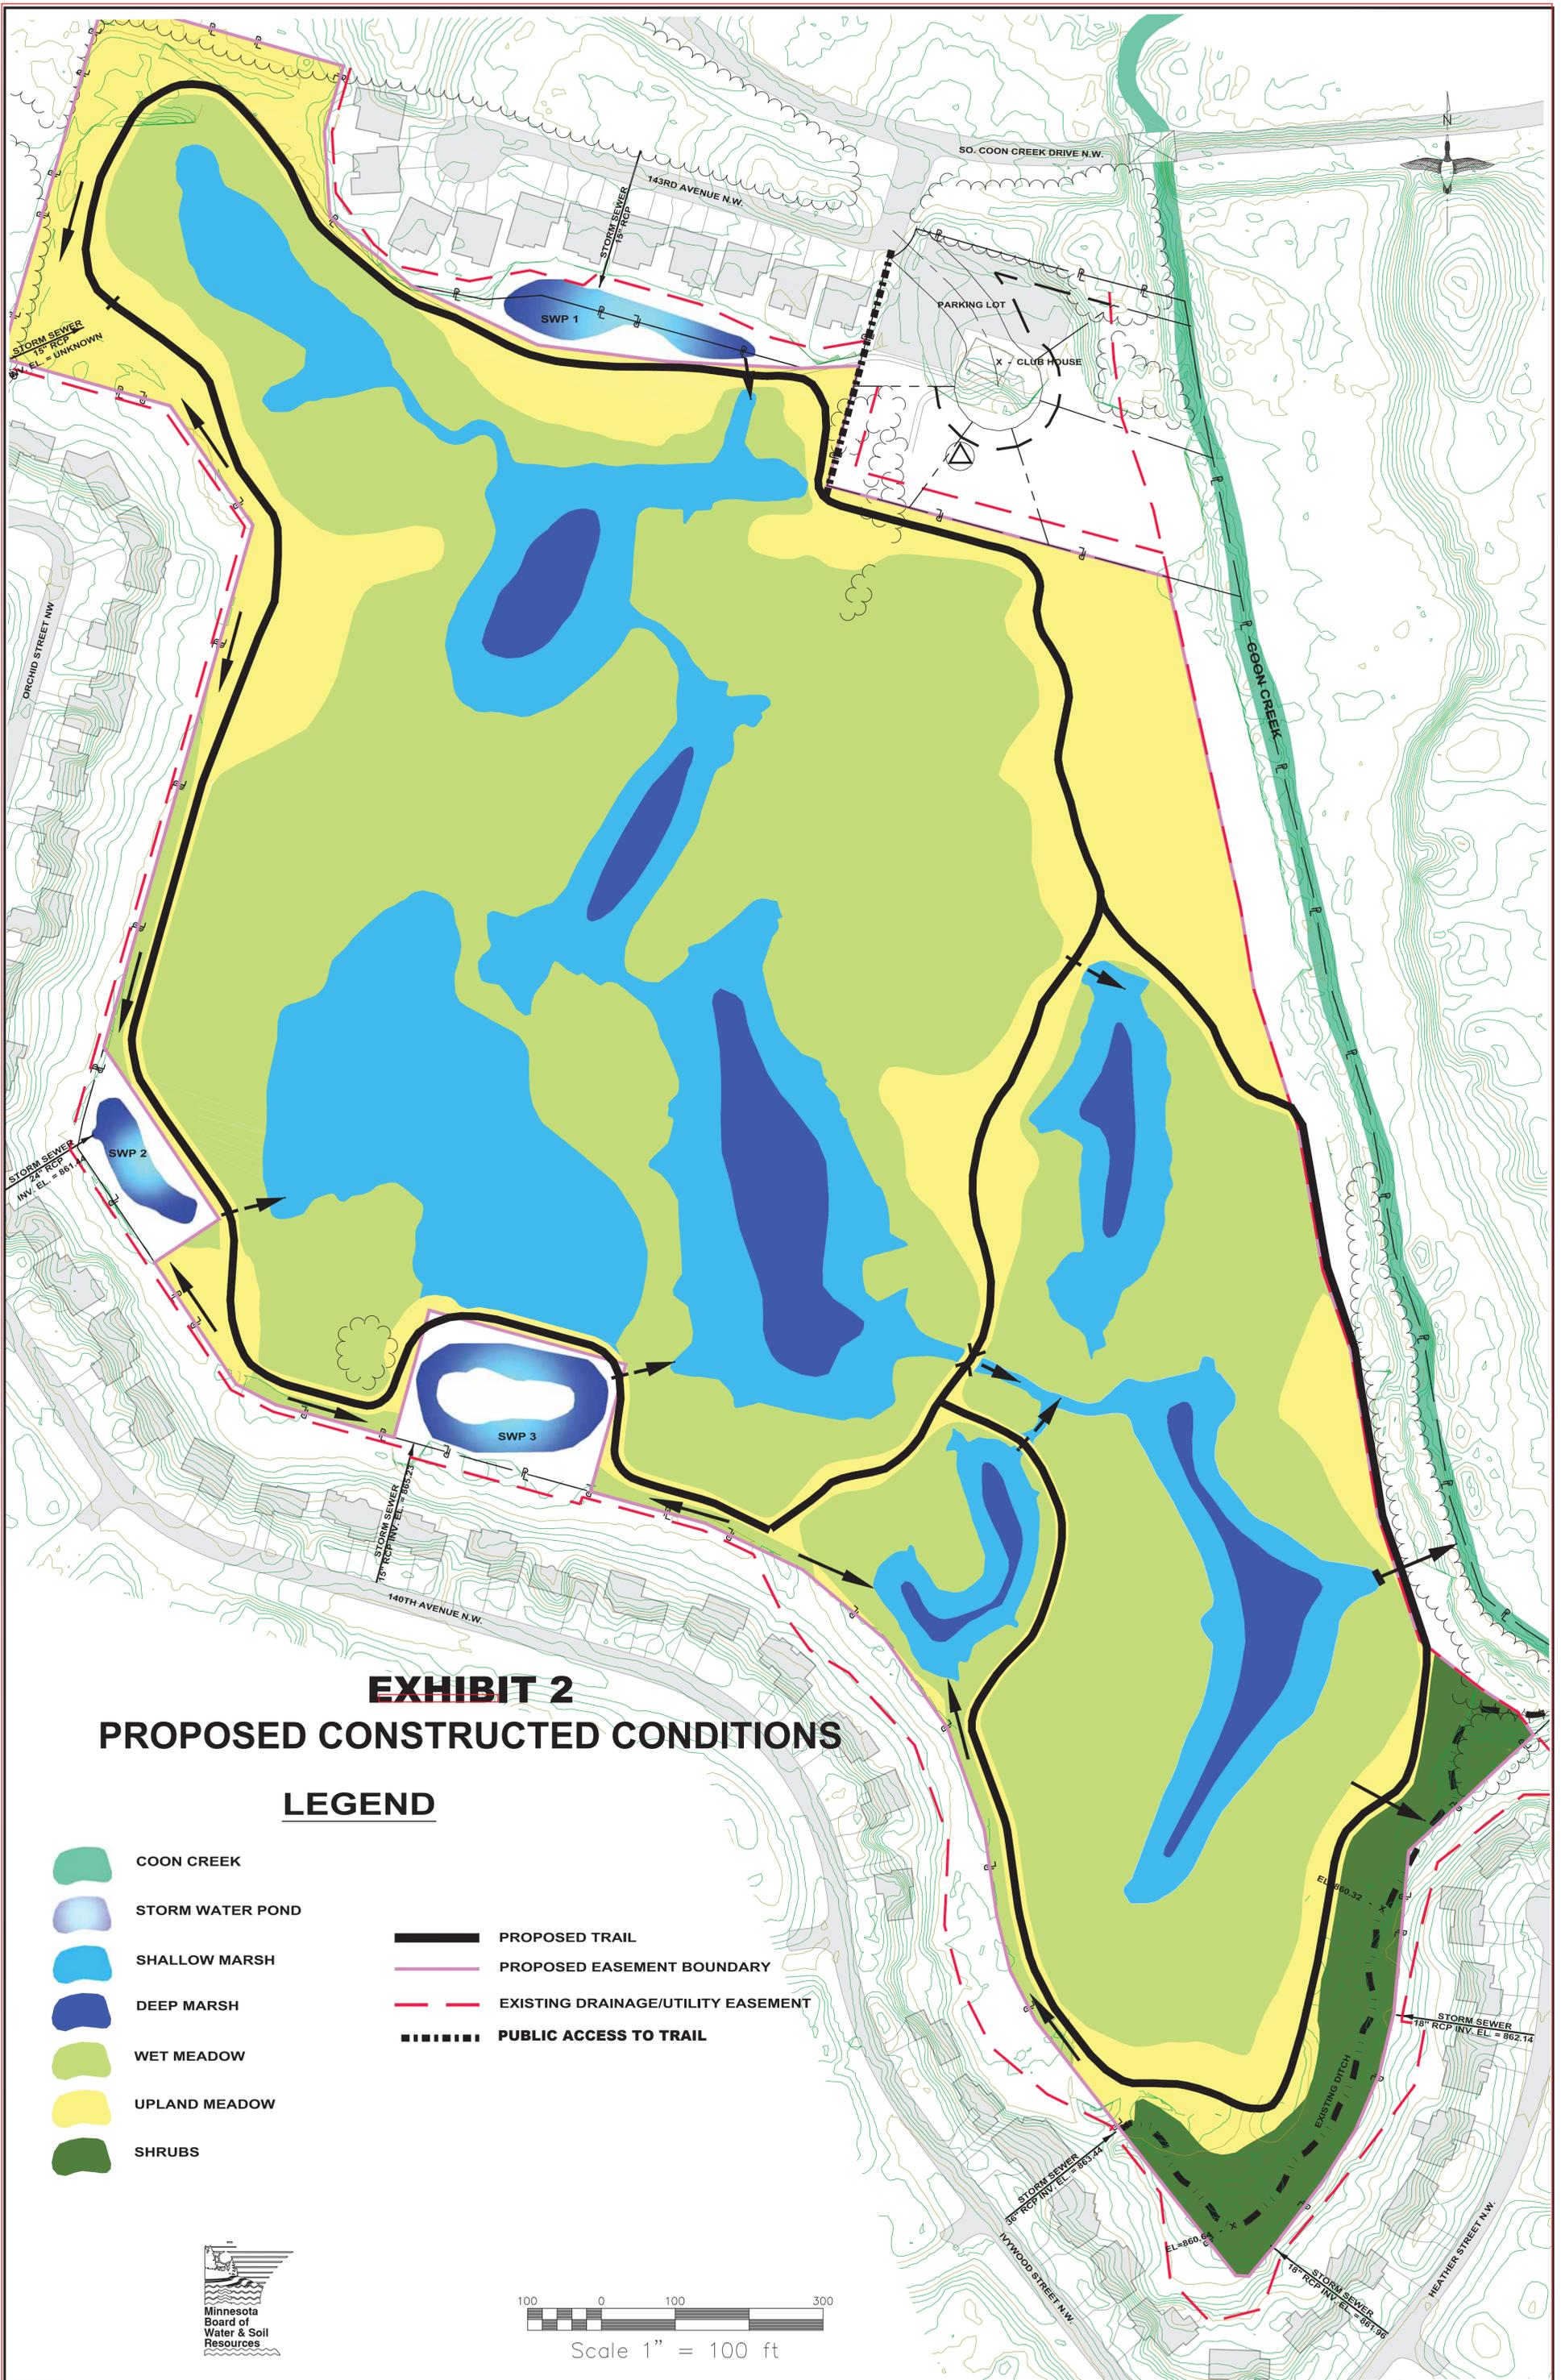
PROPOSED CONSTRUCTED CONDITIONS
